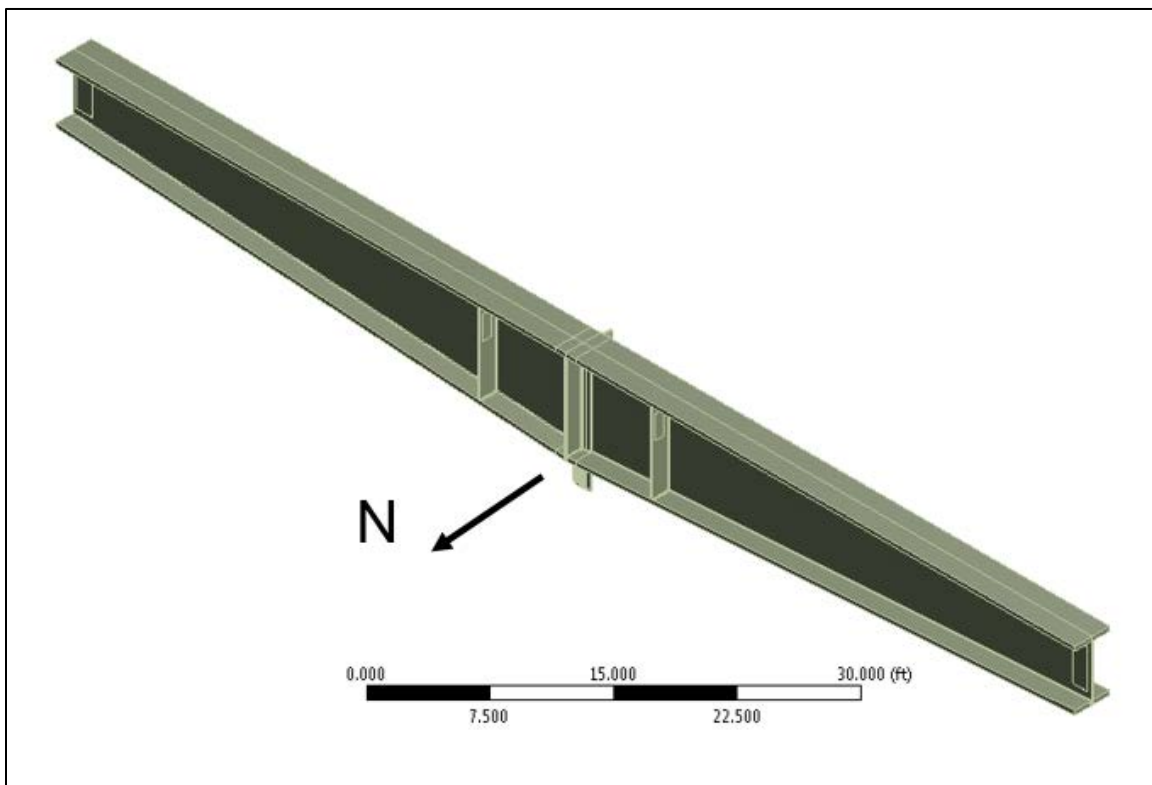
TPG3 girder geometric model – Fremont Street D.4 line
